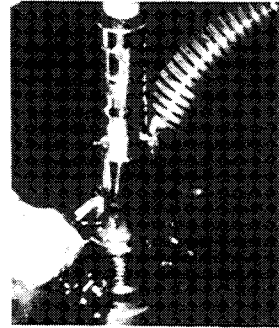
5: Vacuum Blasting Equipment an Example of Abrasive Recovery Methods
